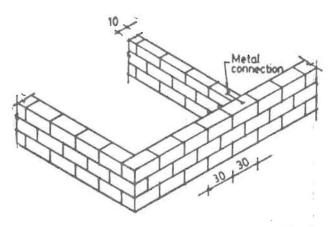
Corner & T-Junction ,of 15×10cm Wall
